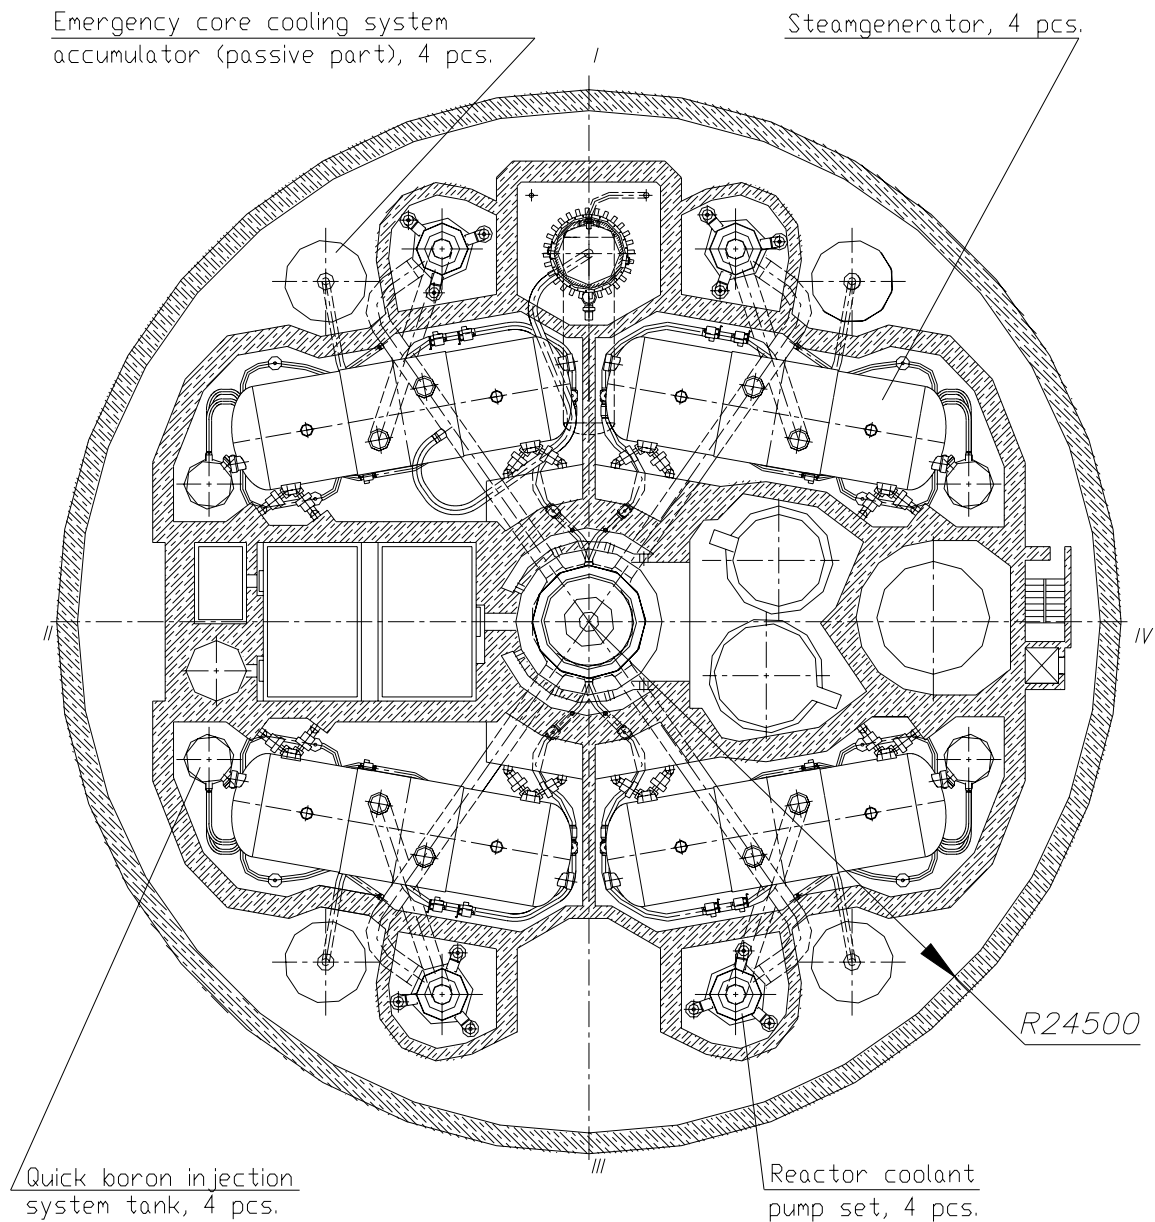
Layout of the RP V-448 equipment (cross section)
